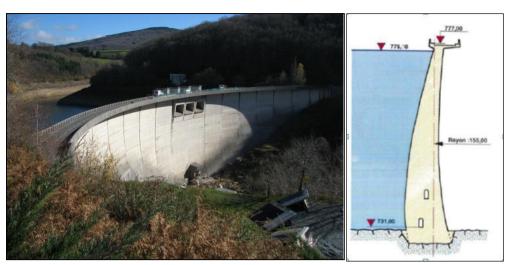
downstream view of the Laouzas dam and central cantilever design.
